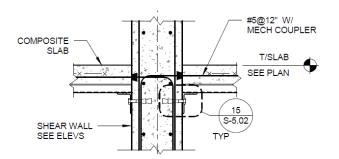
Slab-to-Wall Connection (Sheet S-2.11 Detail 10)
